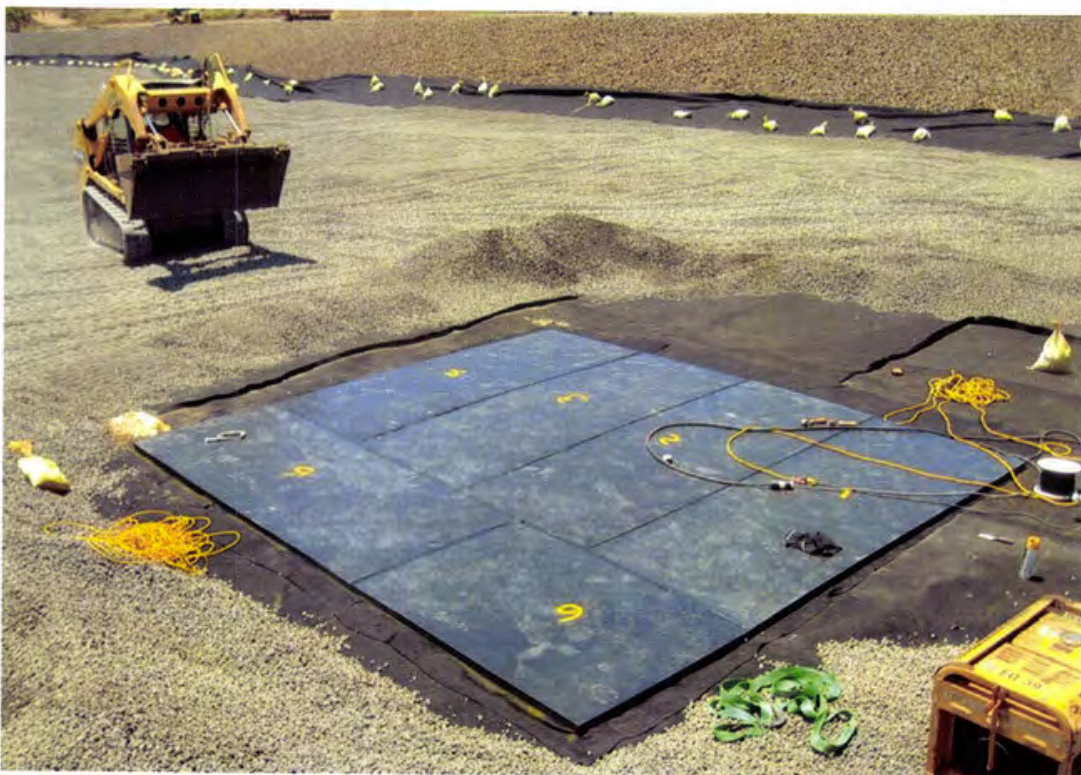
Six extrusion welded 2-inch thick HDPE flatstock panels, underlain by two layers of 16 oz/sy nonwoven geotextile, form the base support for the aerator pads
